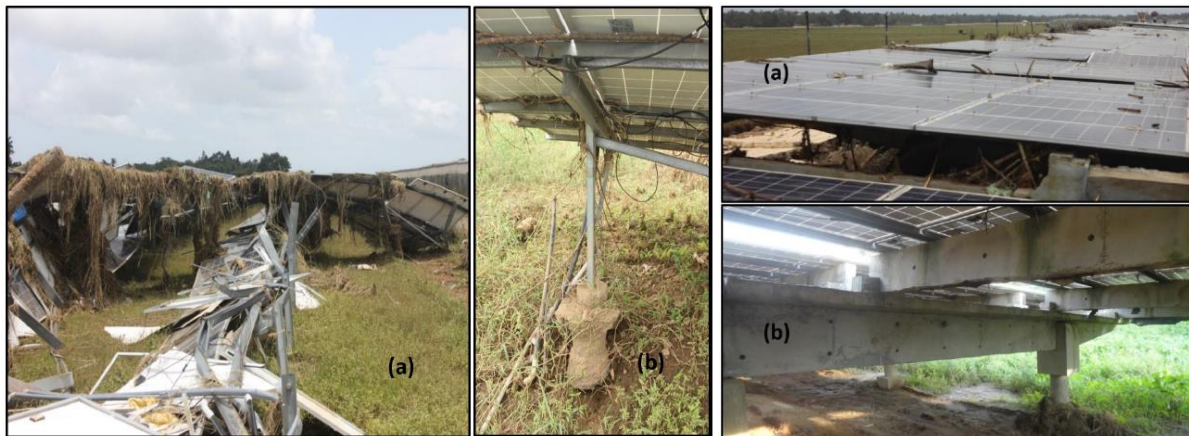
Damage to modules and structures (a-left) and structures' foundations (b-left) due to submersion with fast-flowing waters [2]. Another case of a PV plant after having been submerged under fast flowing water, showing limited damage on the upper part of its PV arrays (a-right), with a view of its all-concrete structure underneath (b-right).
